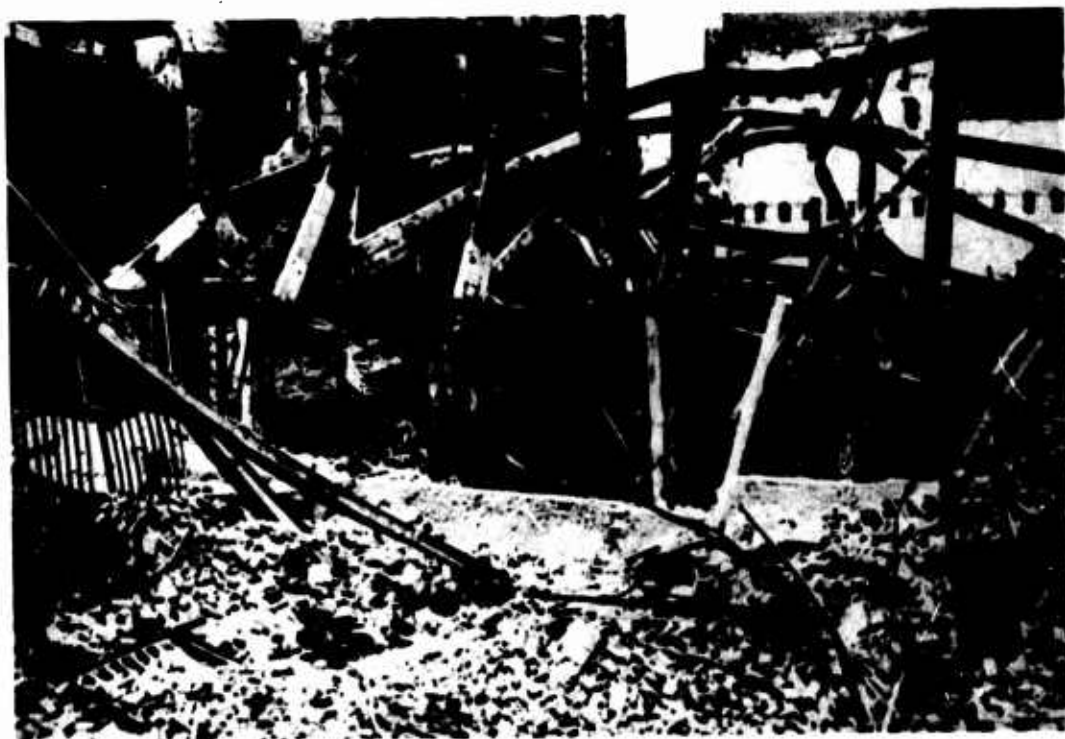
, 34 TWISTED STRUCTURAL STEEL, CHARACTERISTIC OF STRUCTURES
